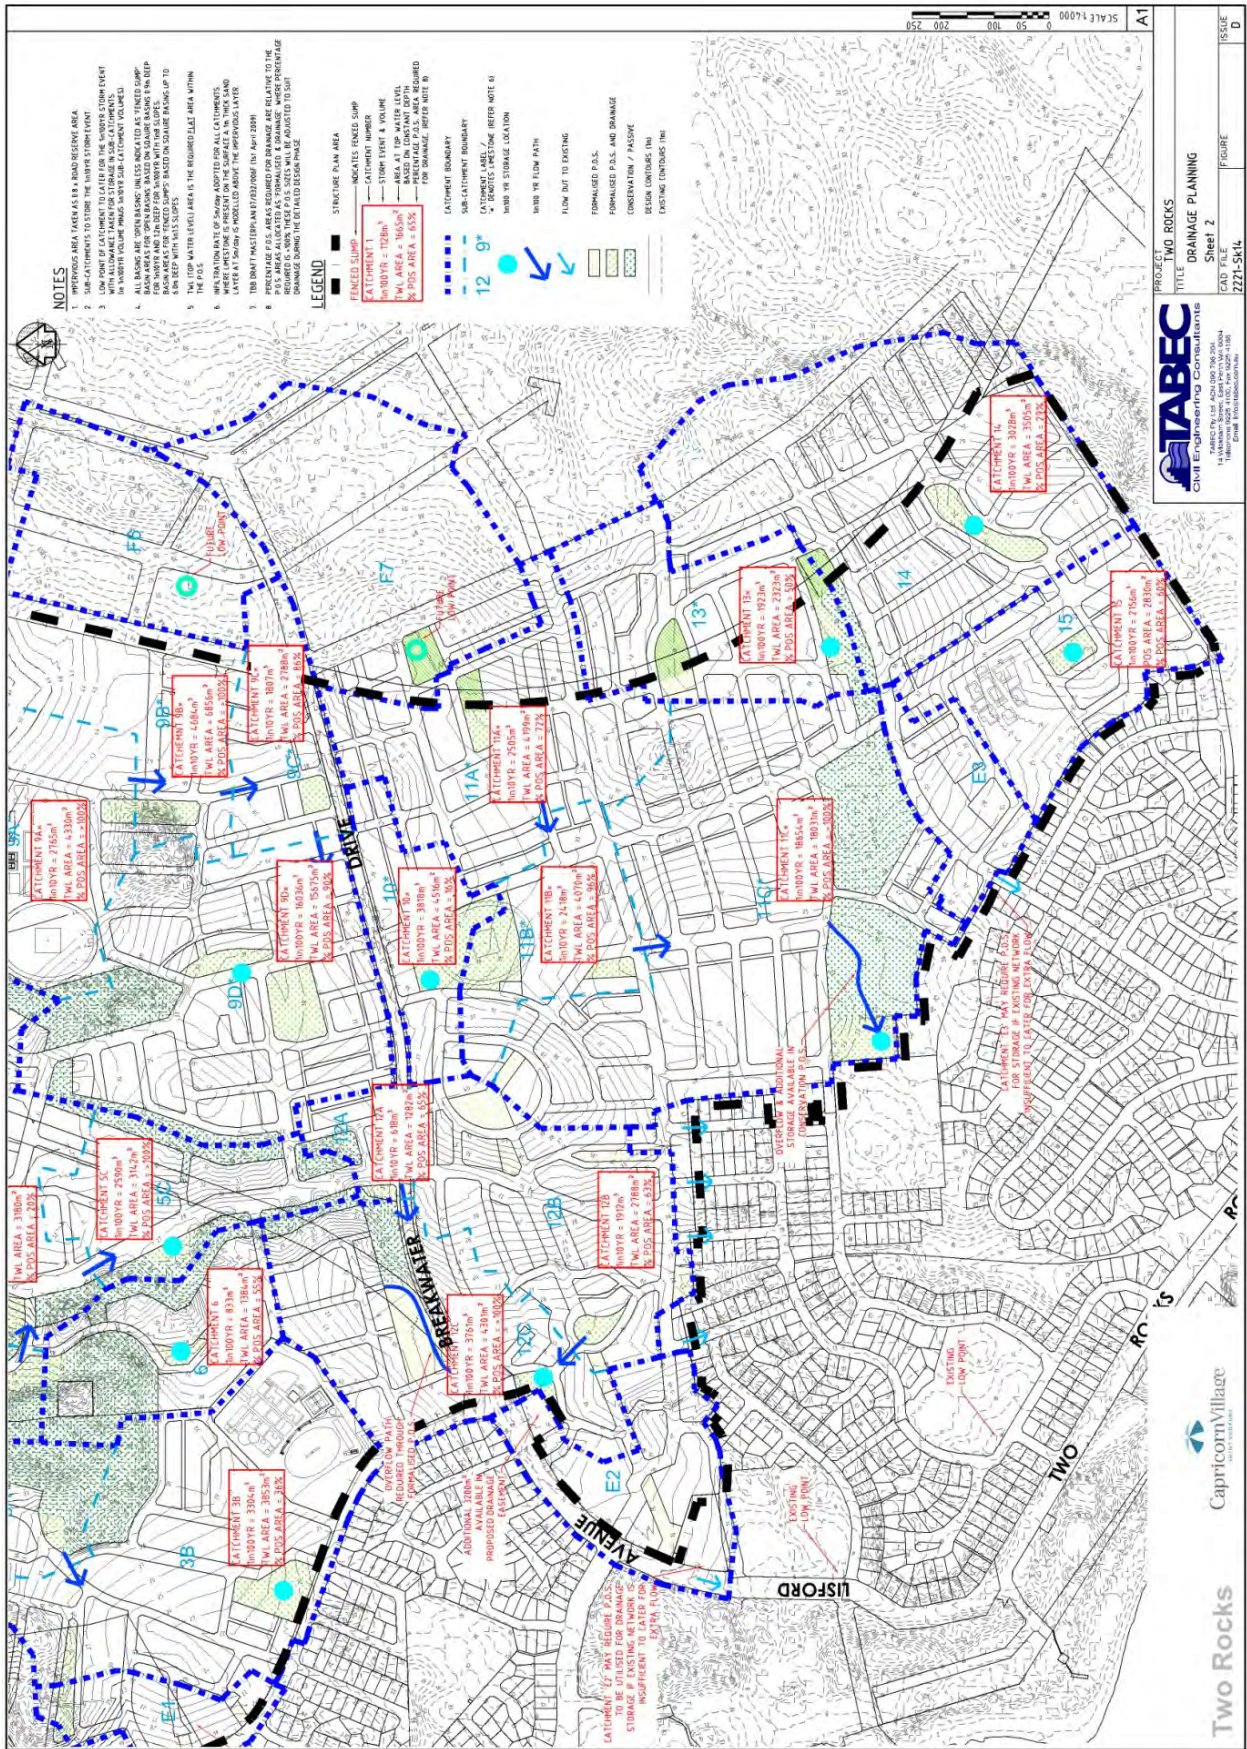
PRELIMINARY DRAINAGE PLANNING AND EARTHWORKS [SOURCE: TABEC]
